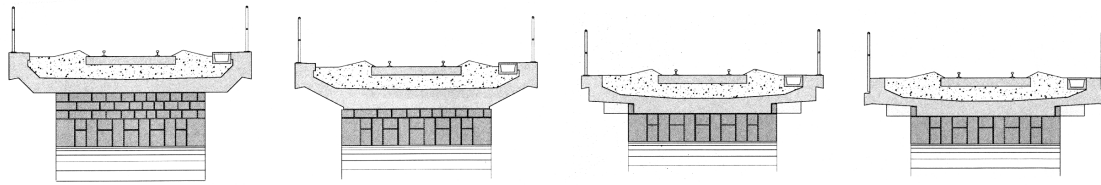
Trough variants (Fachstelle für Denkmalschutzfragen SBB)
